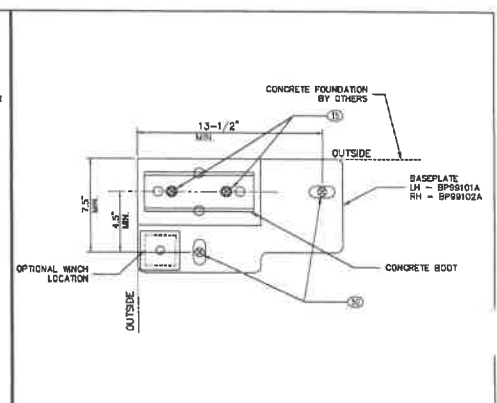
CONCRETE BOOT MOUNT - BAG COVER
